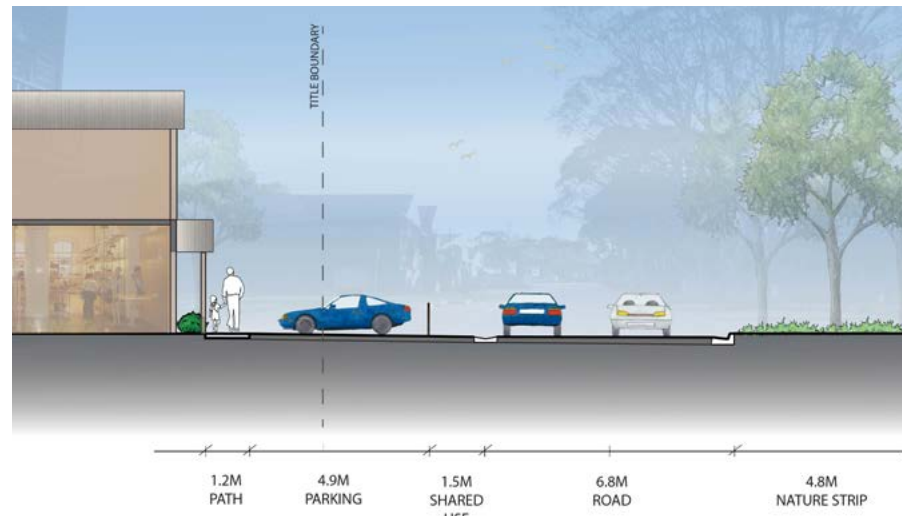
Existing Big Muster Drive - Core Commercial / Retail Precinct - Castran's Corner to Tower Road
